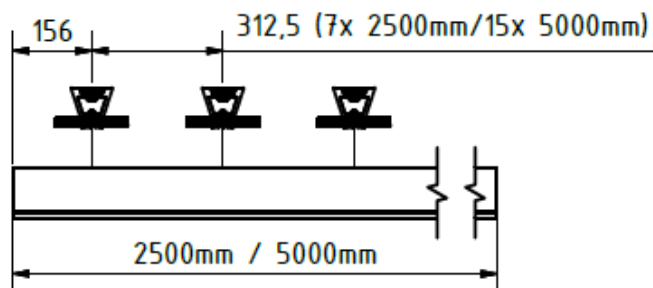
23. Product drawing from OnLevel for profile 6031 Side Mount – 3.0 kN/m, sheet 3 of 4.
